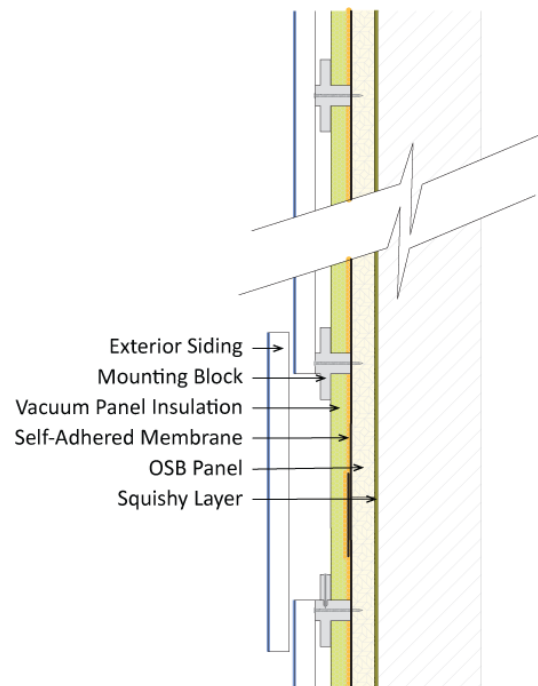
Vacuum Panel Insulation Assembly – Plan View
